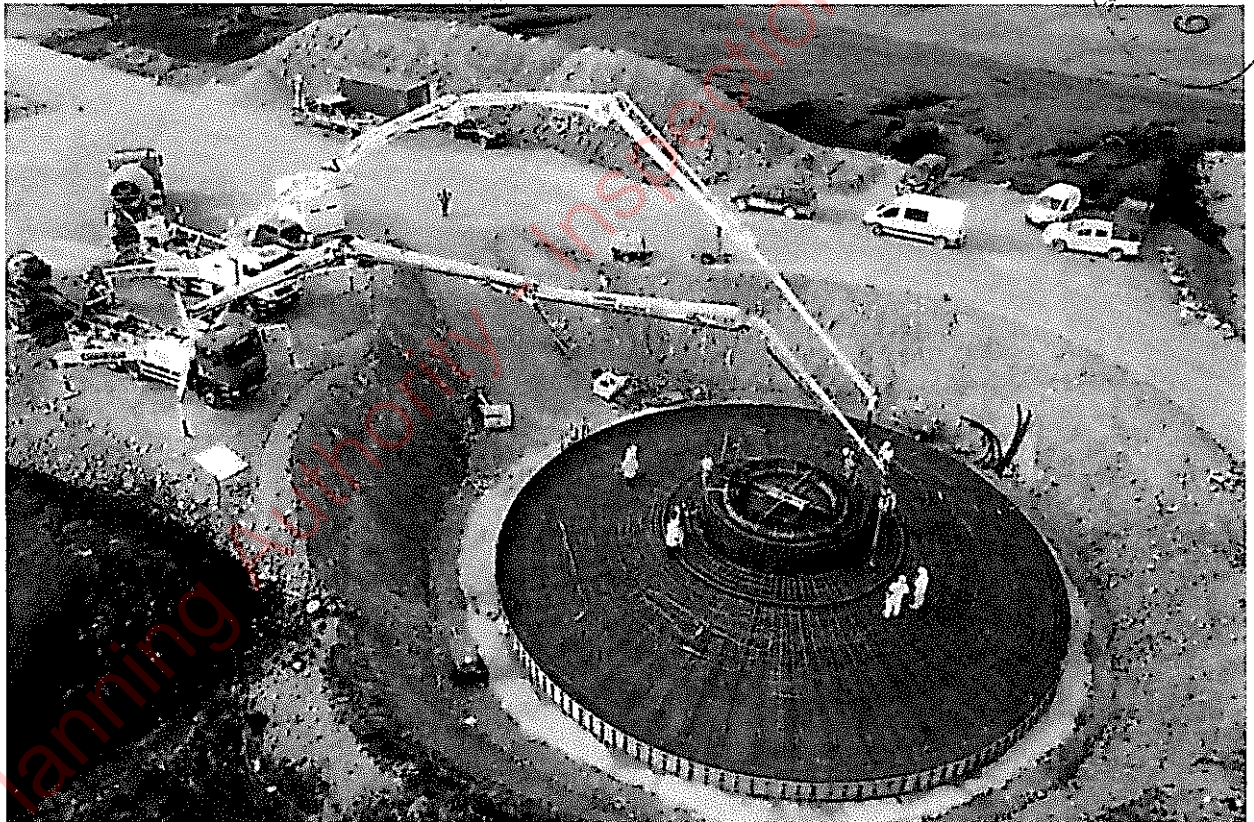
Turbine Foundation under Construction with Adjoining Crane Pad⁵
